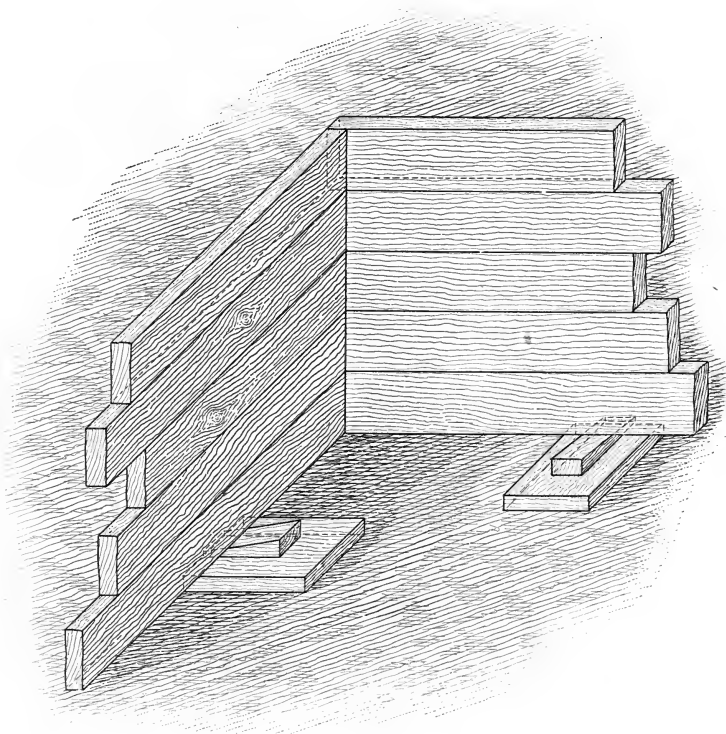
Shows Method of Placing Foot Block and Wedges to Hold Bottom Boards in Underpinning Pit Until Set Is Complete
